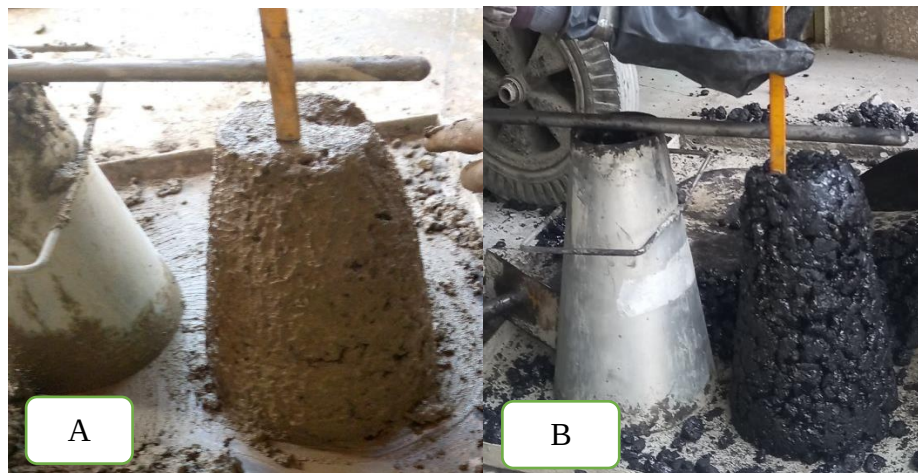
9 Slump Test (A) conventional (B) geopolymer concrete
